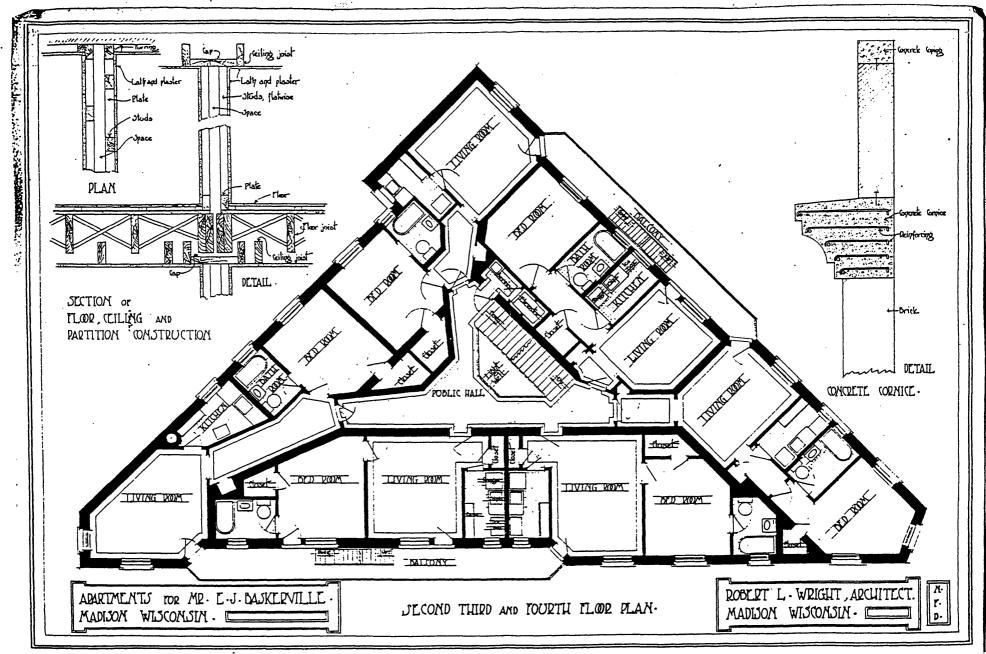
Baskerville Apartment Building, second, third, and fourth floor floorplan.
